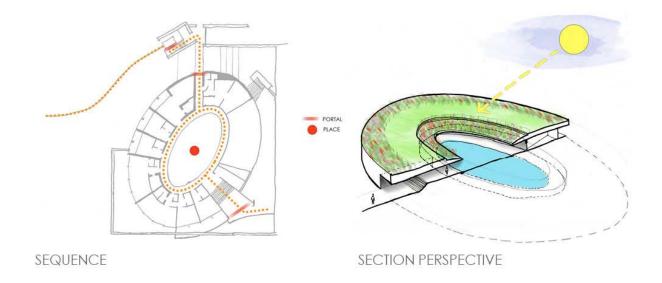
Connection between sky, roof garden and pool (Source: Author)
